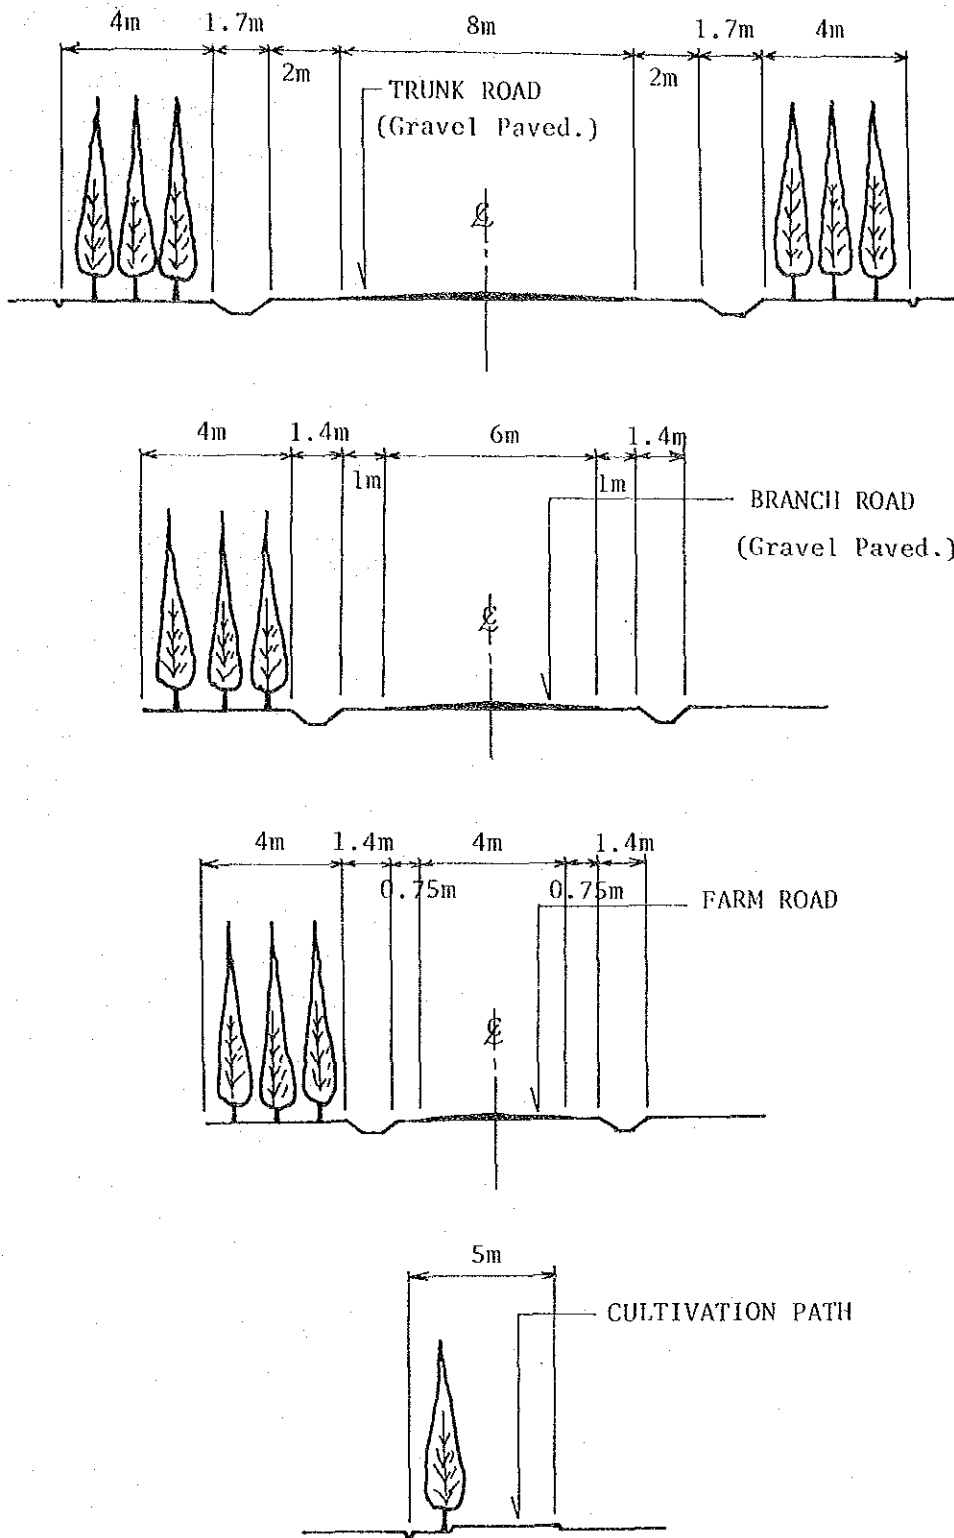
Cross Section of each Road and Allocation of Wind Break
